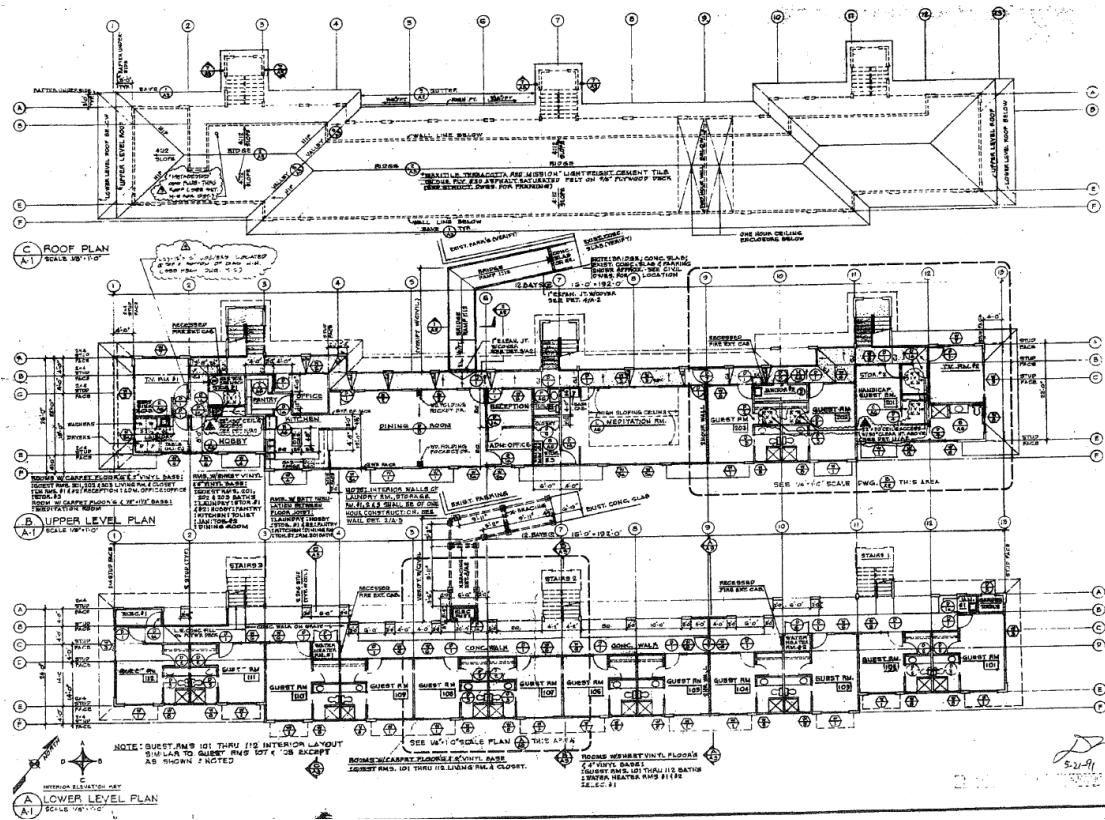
Marianist Hall, Floor Plans¹⁶⁹
